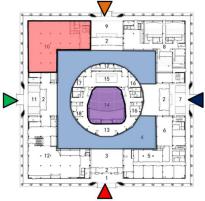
The Ground Floor -source: www.archdaily.com+ student work
